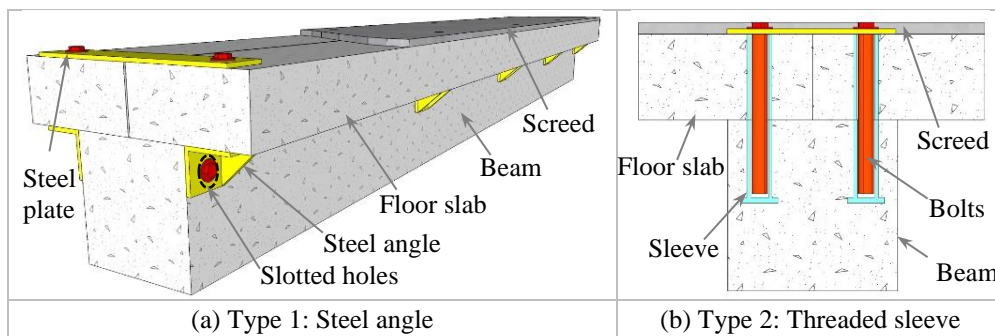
Schematic layout of possible types of removable floor to beam connections
